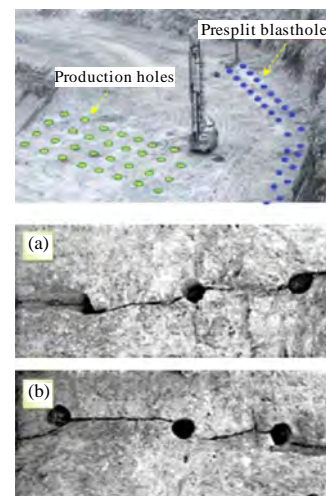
Fracture patterns in the presplitting blast method (a) location of presplit holes and production holes; (b) final fracture plane after presplit blast [21].
